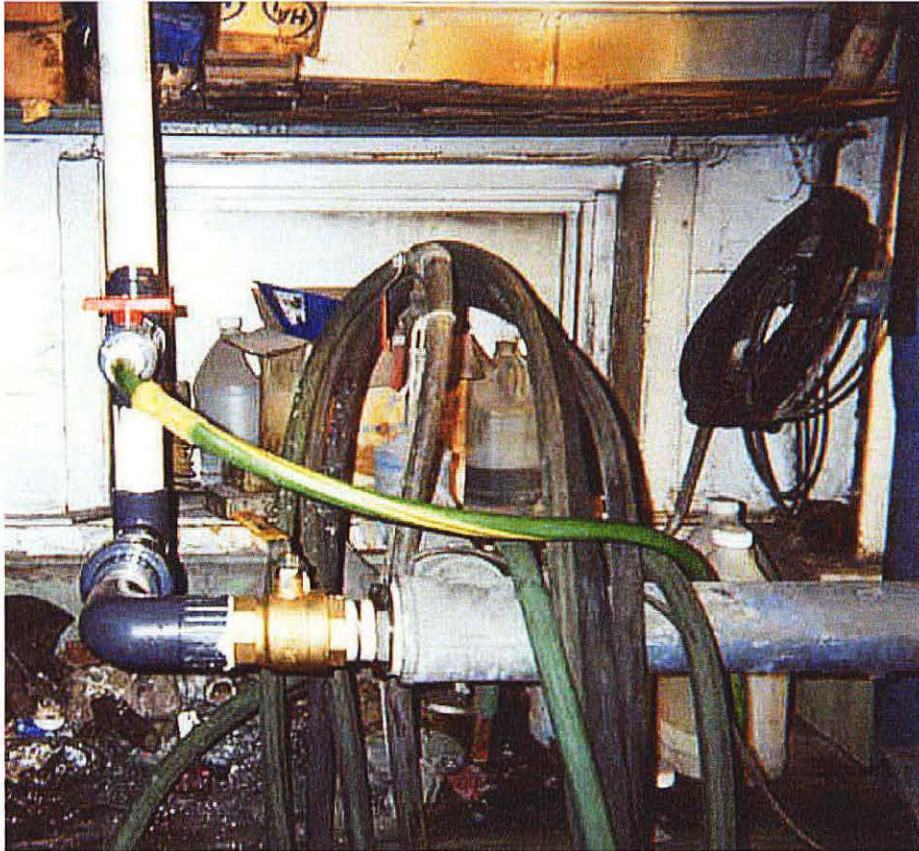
Looking east, picture taken inside the Tecumseh facility's boiler room, which shows the connection of the lactate injection system to Tecumseh's pressurized water line (connection and indoor piping constructed by Tecumseh).
